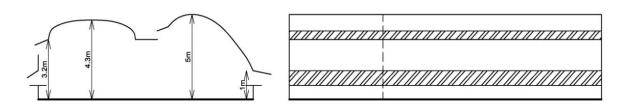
Front and side view of a greenhouse with continuous roof and side ventilation greenhouse.
